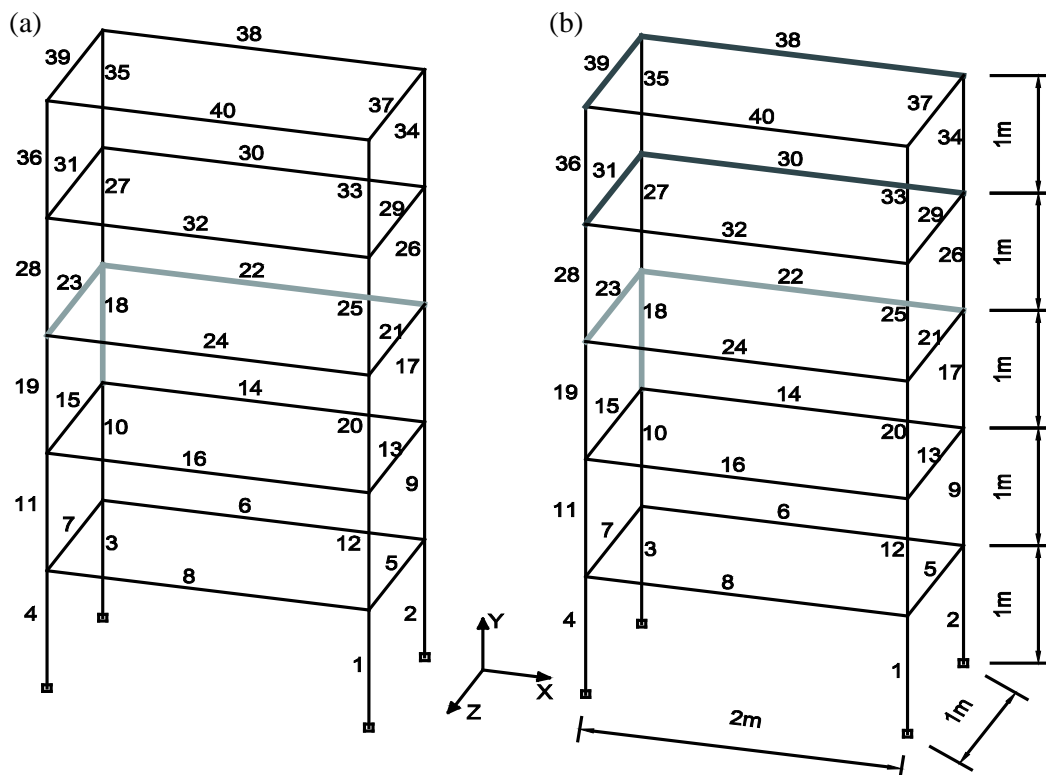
3D Structural diagrams of two building models (a) symmetric building model and (b) asymmetric building model
